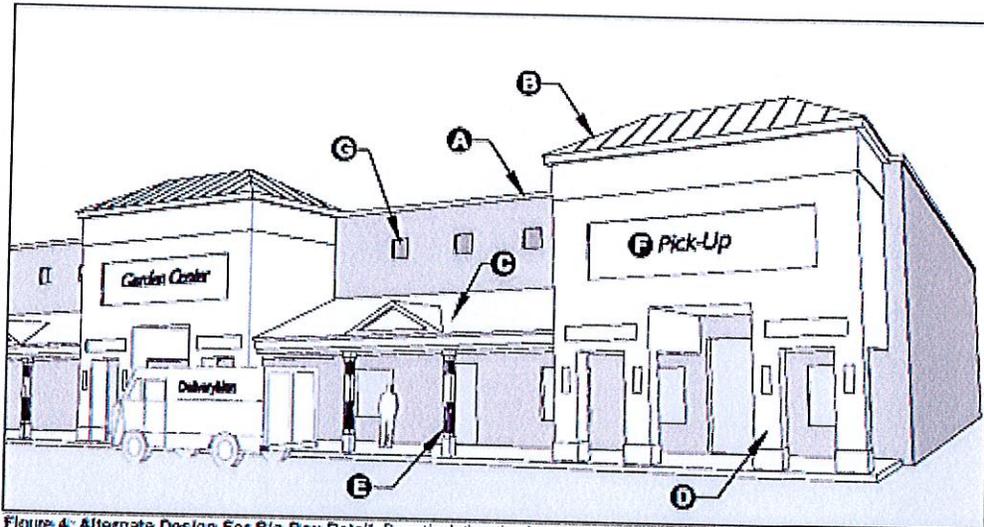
Alternate Design For Big-Box Retail. By articulating the façade of a typical Big Box retail store with different massing elements, you can help to give a smaller scale appearance to an otherwise featureless mass.
